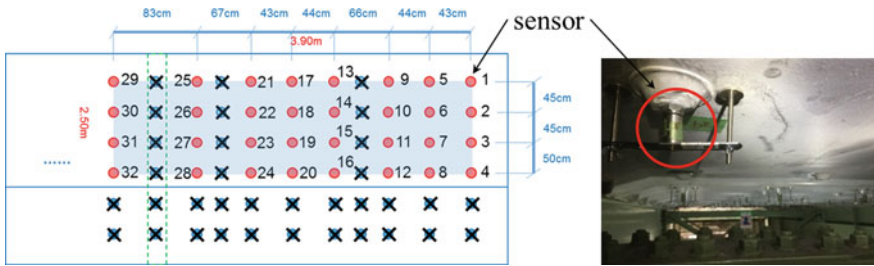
Sensor arrangement (left) and installation of sensor to an anchor (right)
